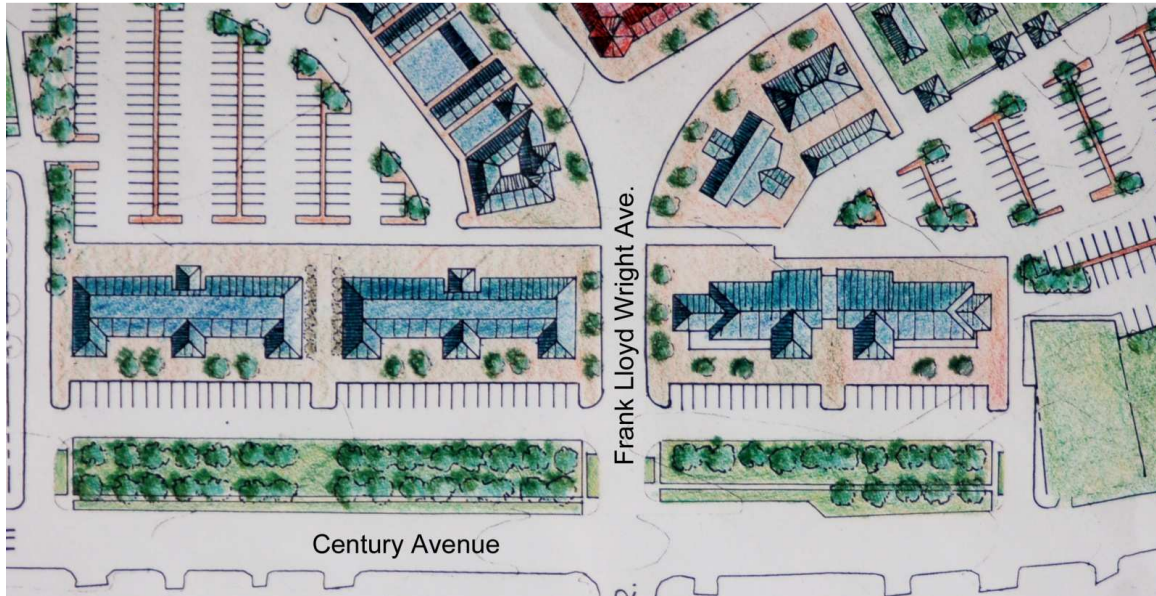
The original Middleton Hills plan with retail fronting Century Avenue.
